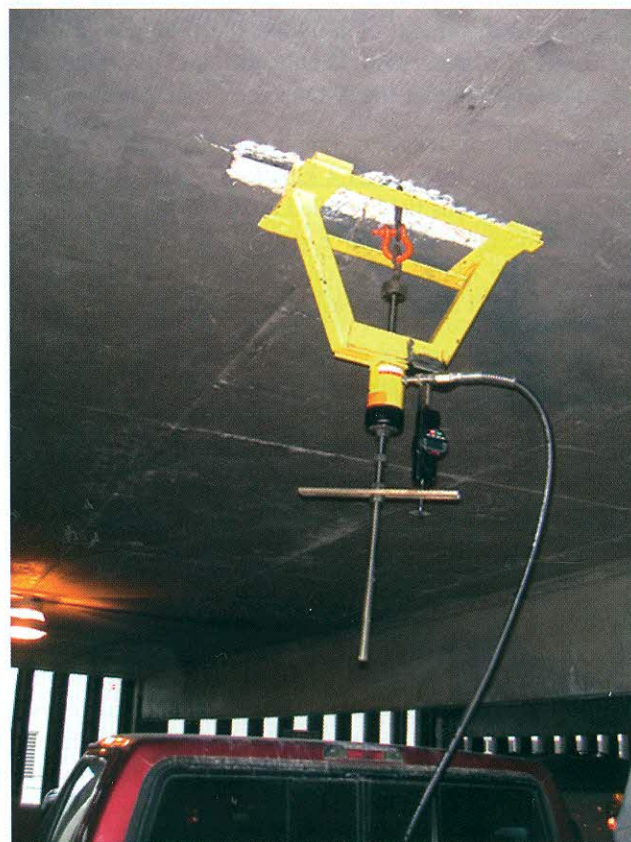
Test Apparatus Mounted on Bottom of Slab
